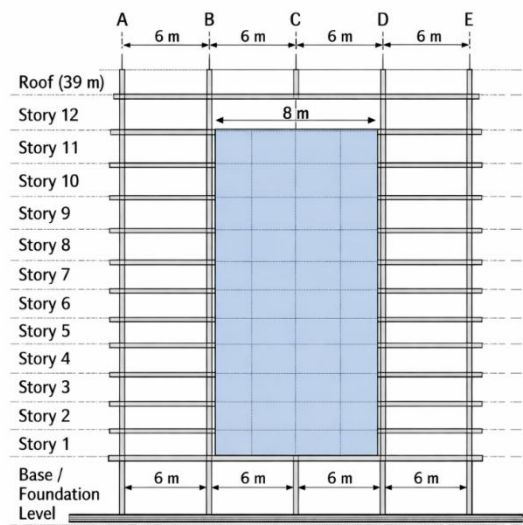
The G+12 structural model's elevation view displays the bay spacing, central core, and beam-column frame.
